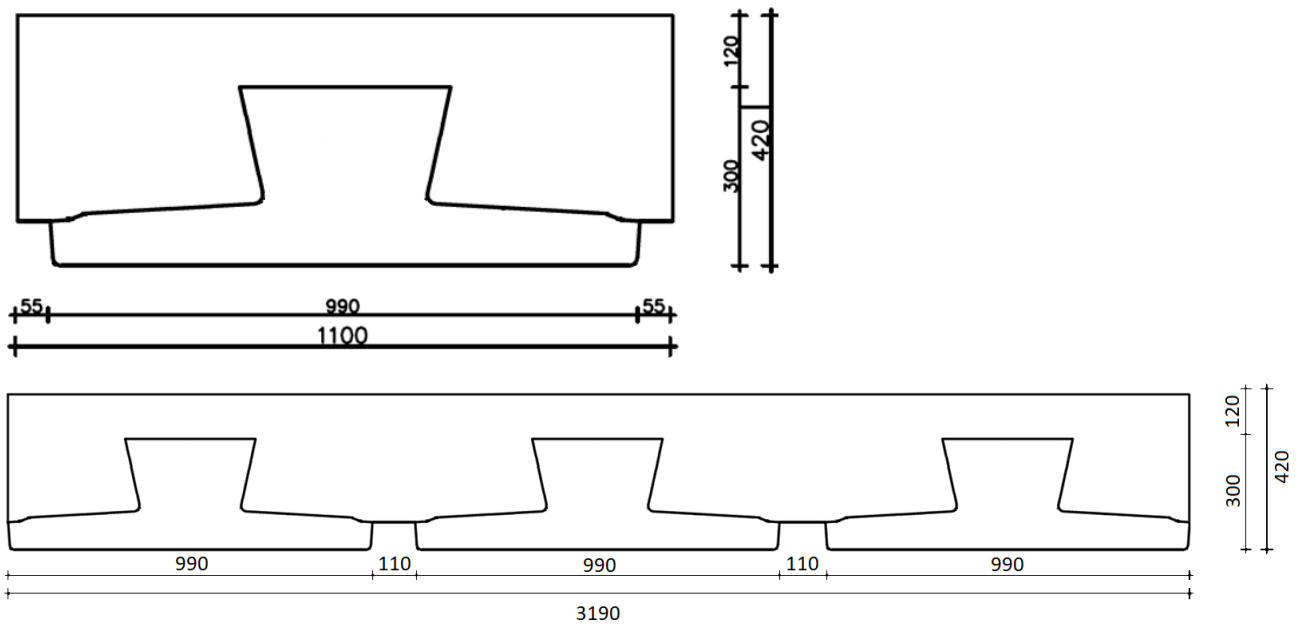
Top: Cross section of a composite beam, with the precast girder in the bottom side of the beam, values in mm
